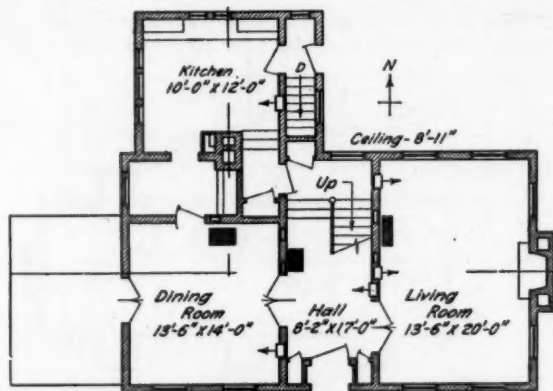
FIRST FLOOR PLAN WITH LOCATION OF WARM-AIR REGISTERS AND COLD-AIR RETURN GRILLES (FOR THIRD INSTALLATION)
